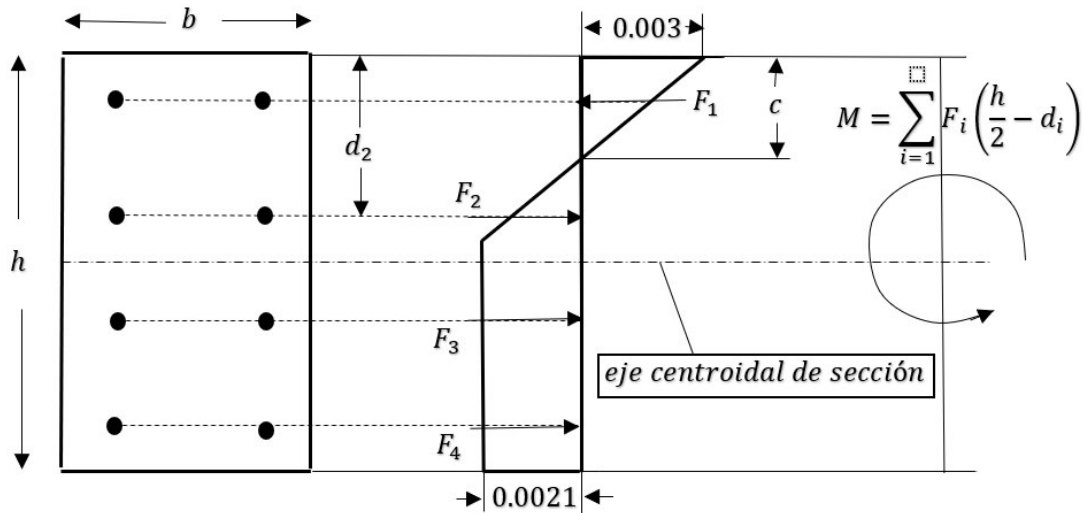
Stress distribution over a concrete cross section subjected to bending. (Own made drawing).
